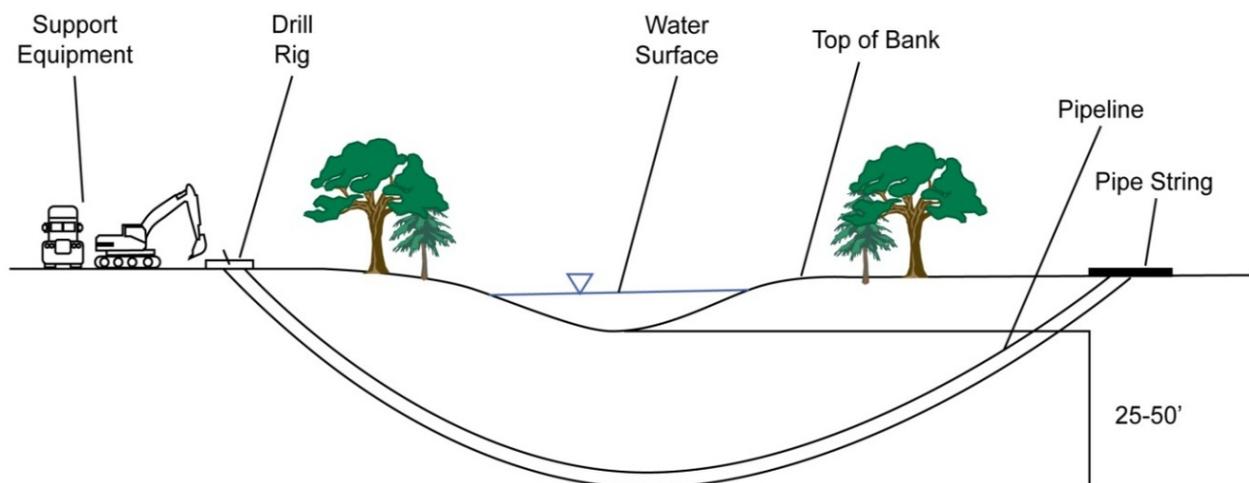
Cross Section of Horizontal Directional Drilling Method
